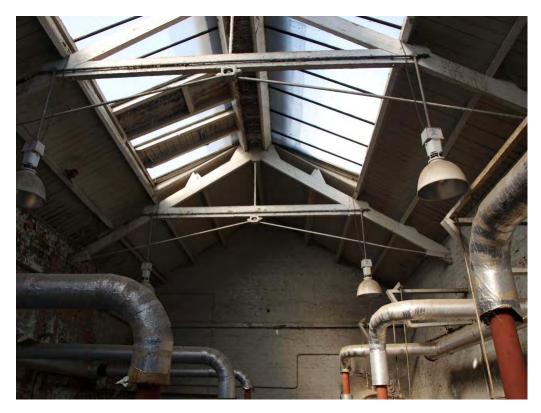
Composite roof truss, south side of Factory Boiler House (former Carpenters' and Coppersmiths' Shop) (15c)
